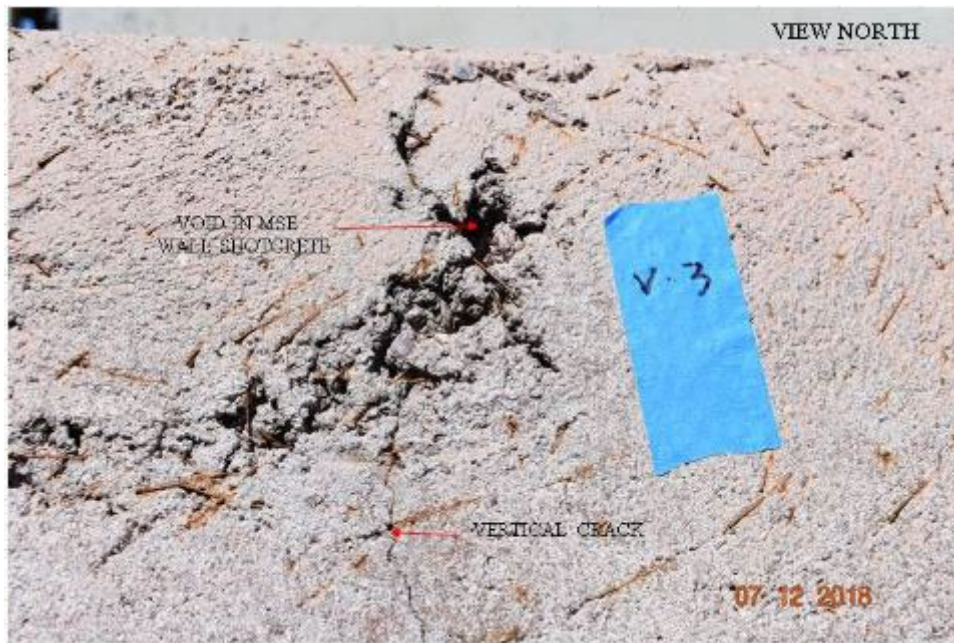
Void and Vert. Crack in MSE Wall Shotcrete, STA 1 + 92, Topaz Bridge
